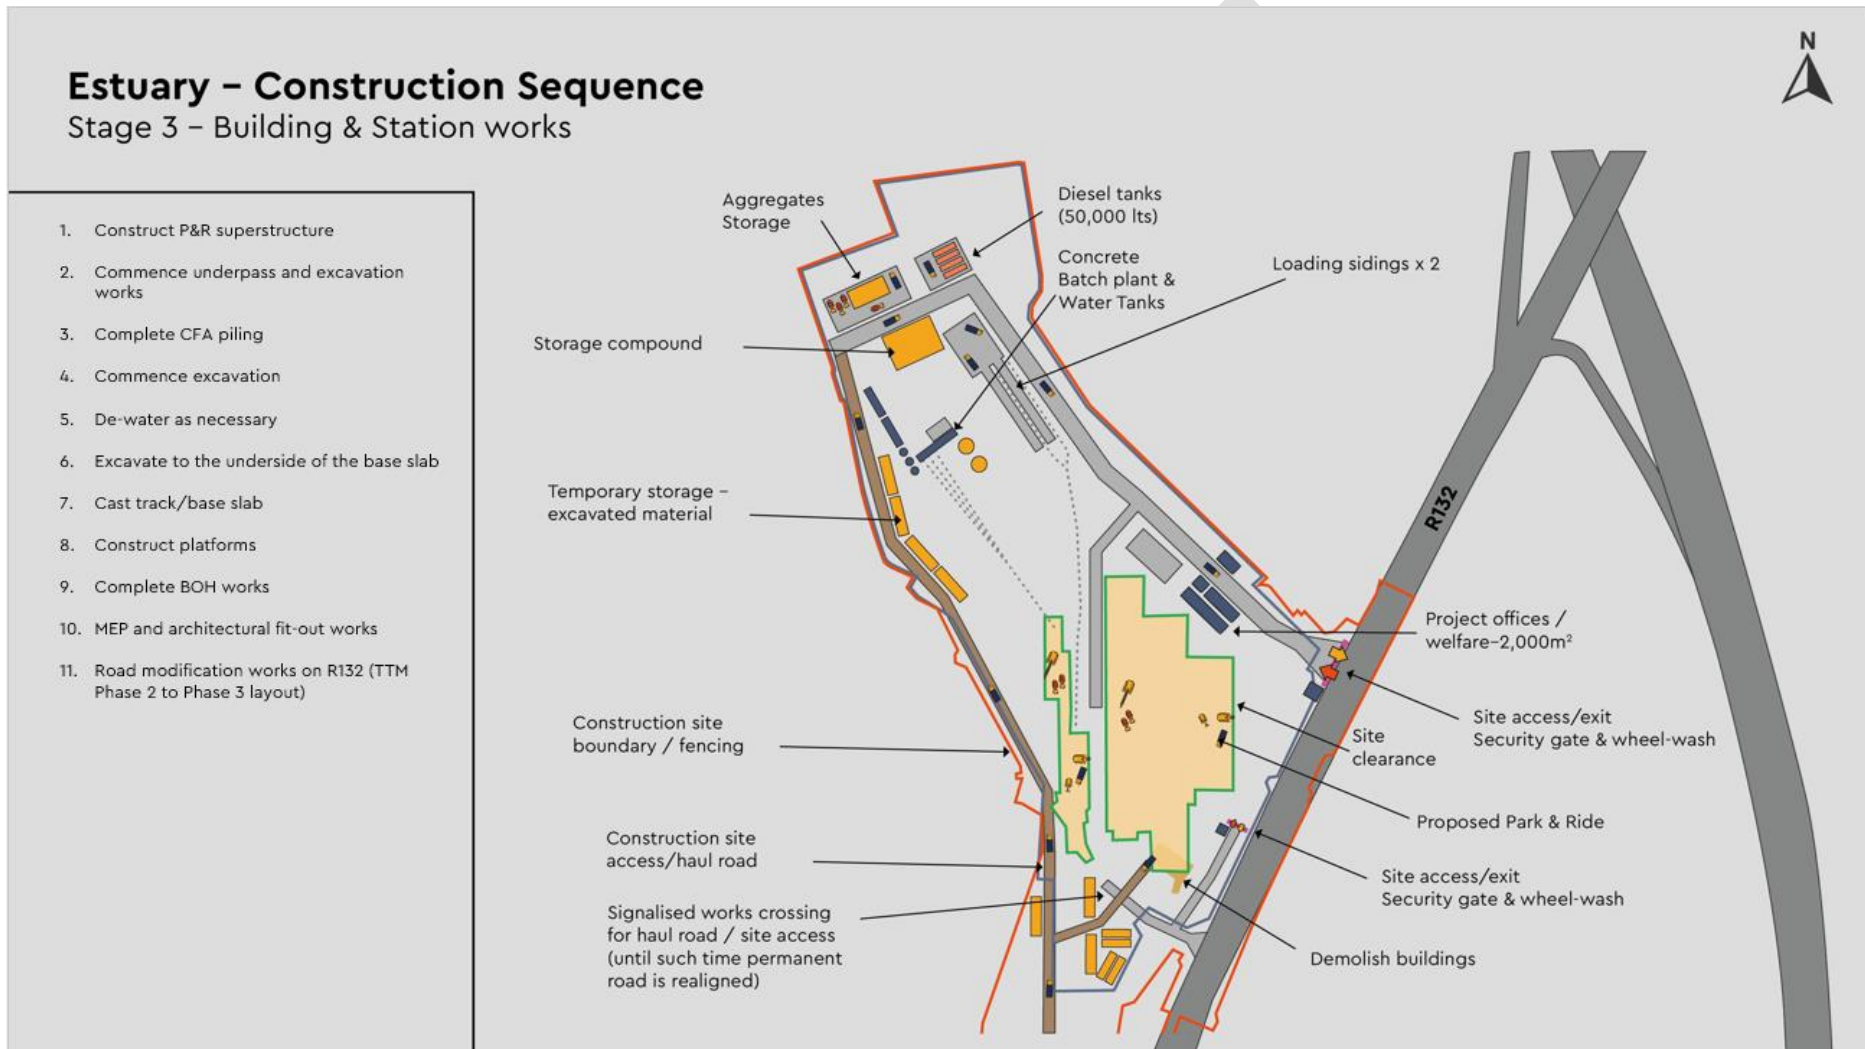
Estuary Station Stage 3 - Building and Station Works
